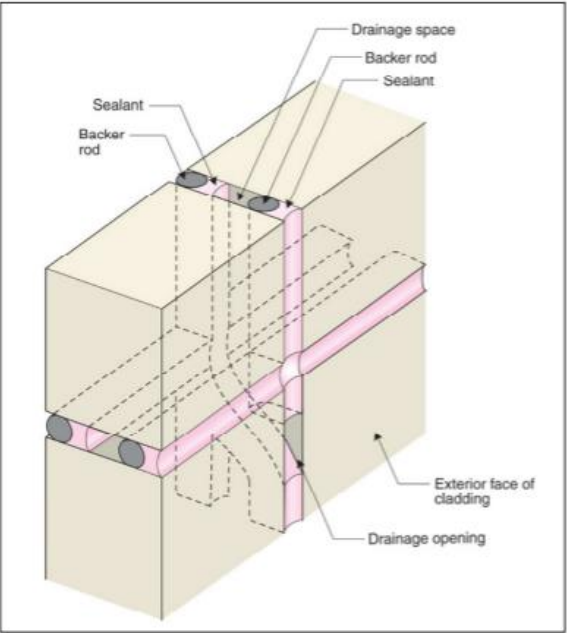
Details of a two-stage joint at a drainage/vent hole. Image copyright RDH Building Science Inc., used with permission
